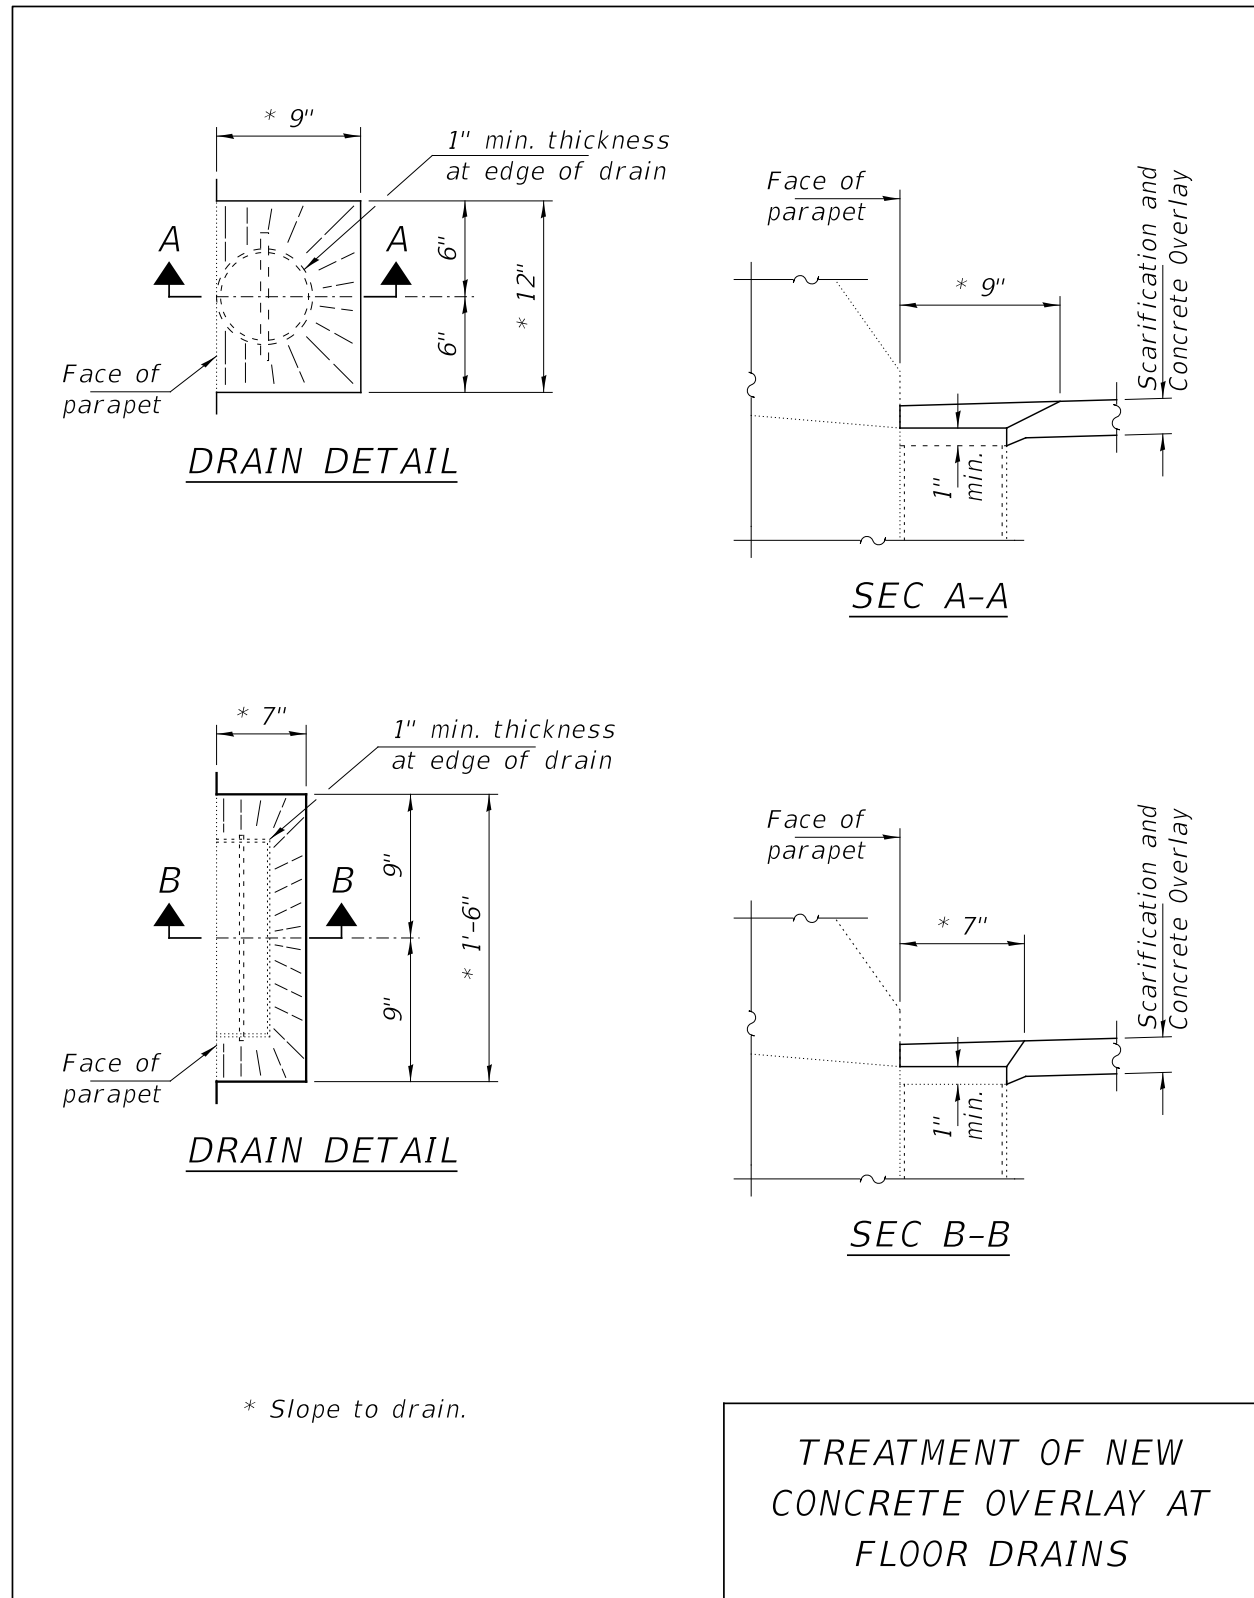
Treatment of new Concrete Overlay at Floor Drains
